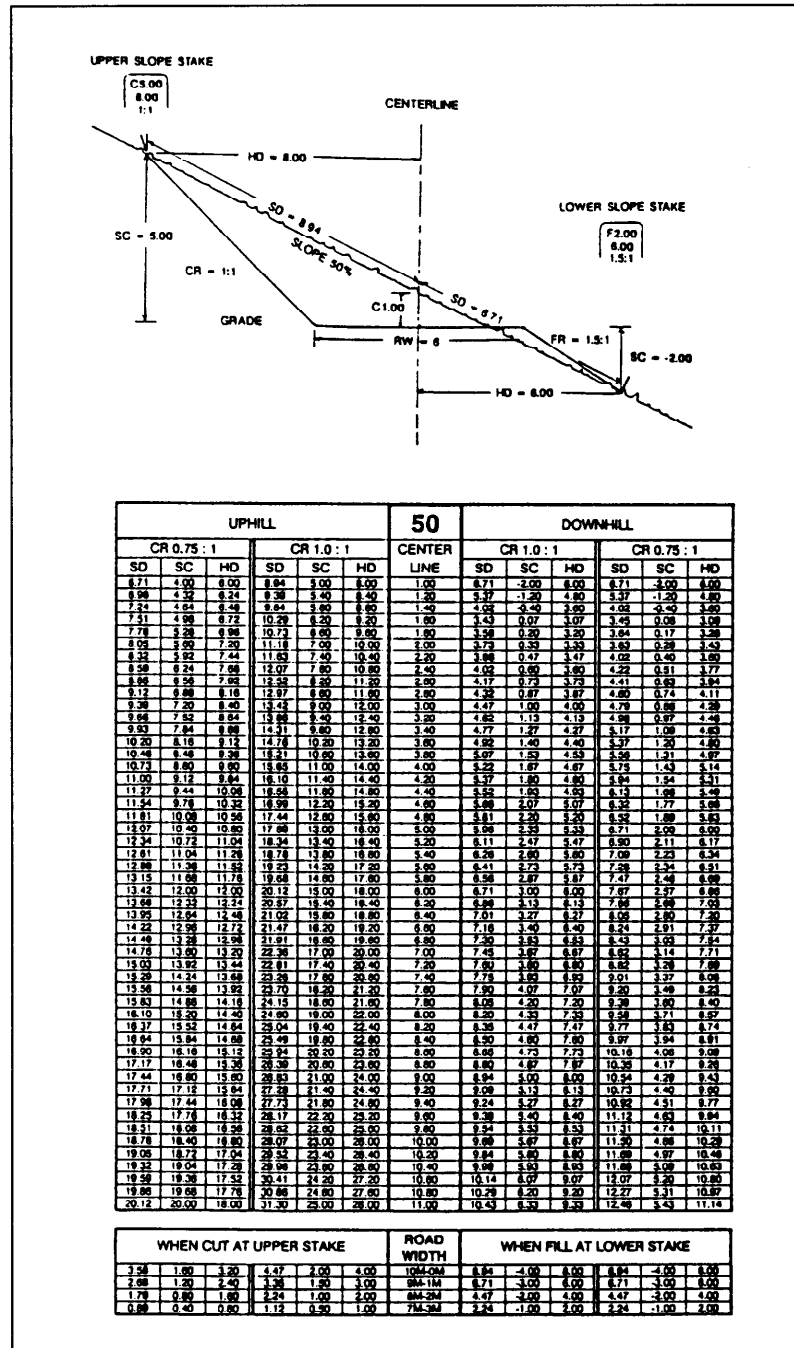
Slope stake tables (lower portion of figure) and location of slope stakes on a typical road cross-section (upper portion).
